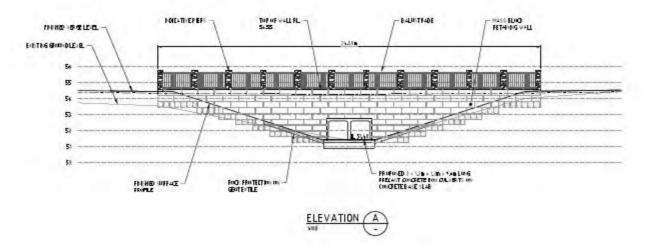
Ki-it Monger Brook road crossing preliminary engineering design
